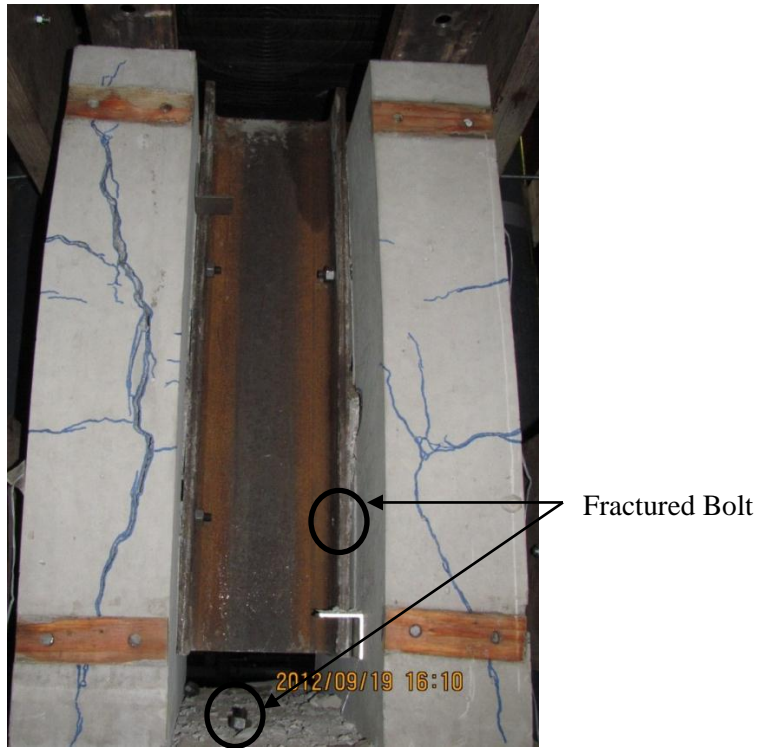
Bolt Fracture Failure – Specimen SL S-0
